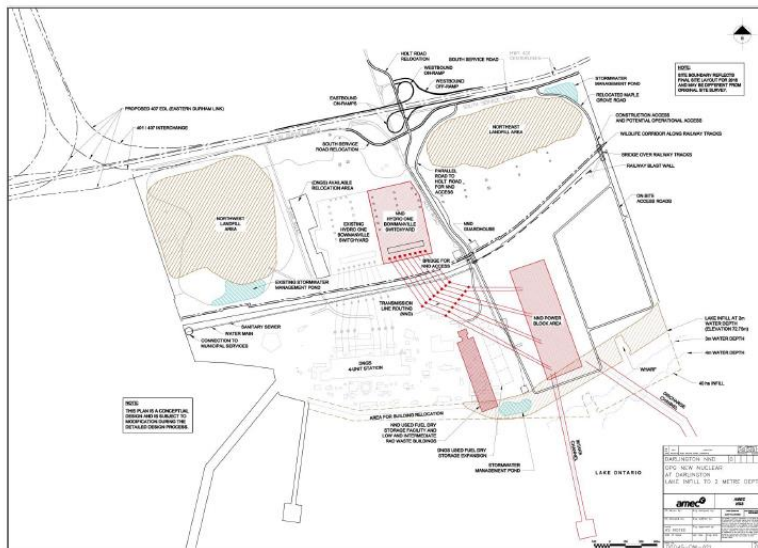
OPG Darlington New Nuclear Project (DNNP) Proposed Site Layout
